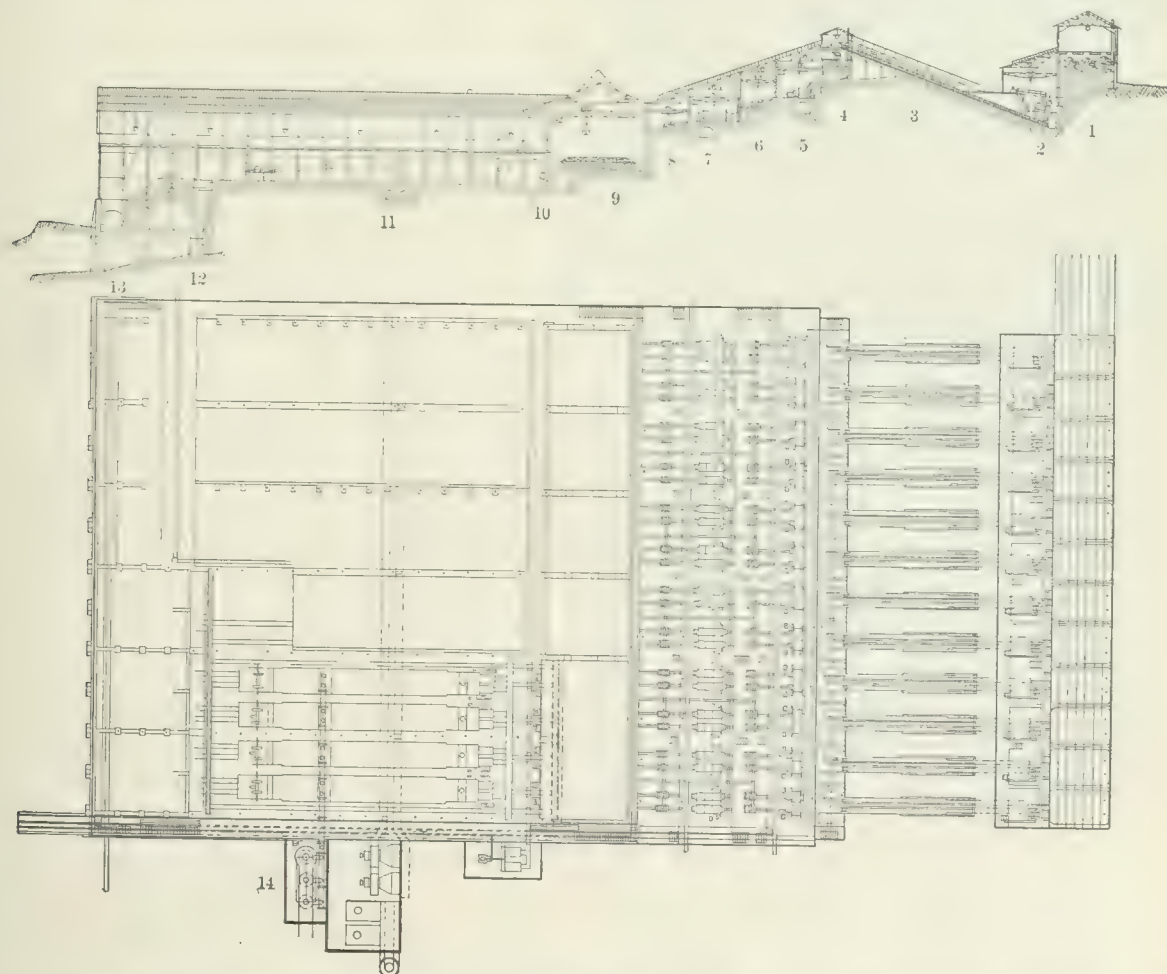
General Arrangement of Concentrating and Briquetting Plant. 1, Crude Ore Bin; 2, Hadfield Jaw Crushers; 3, Conveyor Belts; 4, Distributing Bins; 5, Ball Mills; 6, Tandem Gröndal Separators; 7, Tube Mills; 8, Finishing Separators; 9, Settling Tanks for Concentrates; 10, Gröndal Briquetting Presses; 11, Gröndal Briquetting Kilns; 12, Storage Place for Briquettes; 13, Railroad Track for Outgoing Finished Product; 14, Gas Producers.
